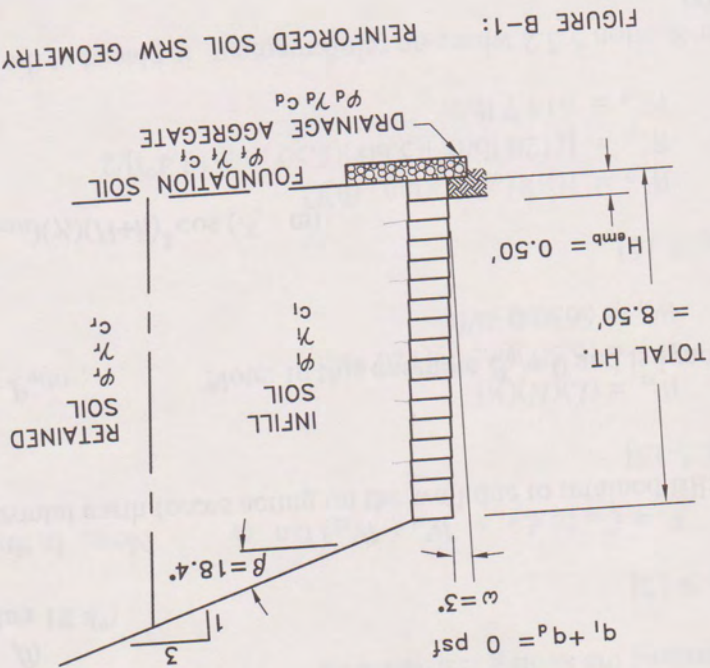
REINFORCED SOIL SRW GEOMETRY
